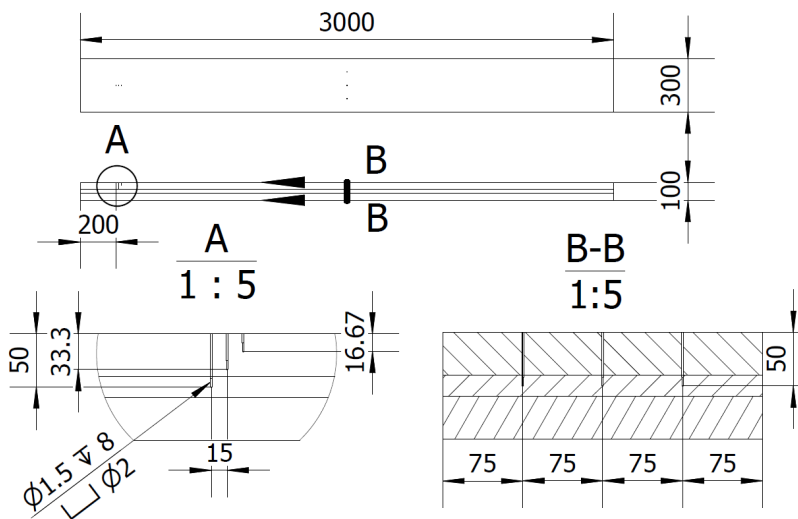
Thermocouples placements within the CLT beams. All dimensions in mm.
